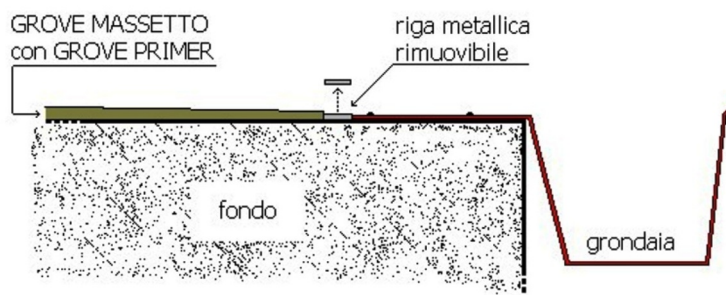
Preparation of the substrate with previously laid gutters and flashing: slope correction.
